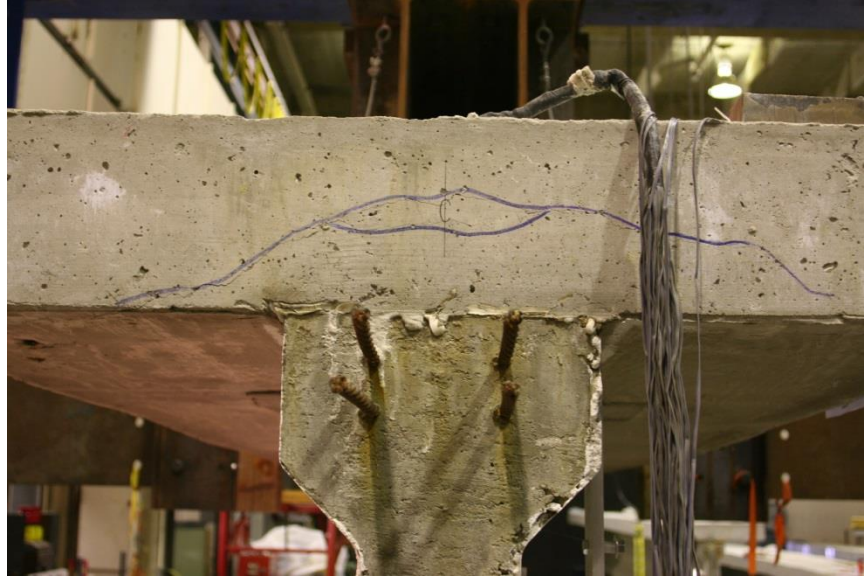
Photo. Shear failure of girder test A9L showing concrete crushing near support.
